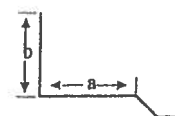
Sidewall flashing is applied when the side of the roof butts up against an adjacent wall. The wall-side of the flashing can either be covered over with siding or sealed with counterflashing. Butyl tape should be applied where the "foot" of the flashing attaches to the roof, and, if used, along the top edge of the counterflashing.
